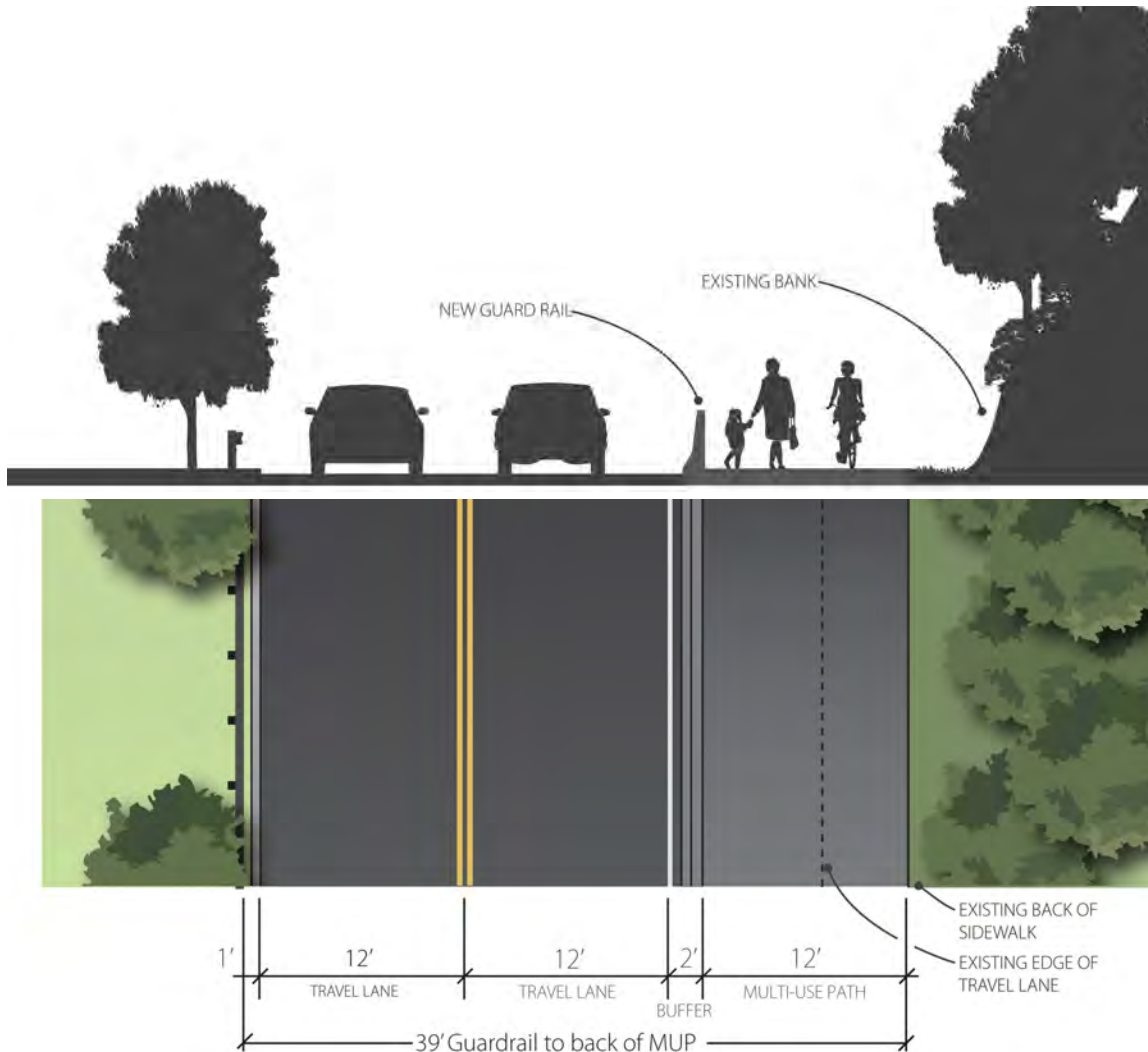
NE 30th Street Leaving Old Town Looking Southeast - Road Diet
